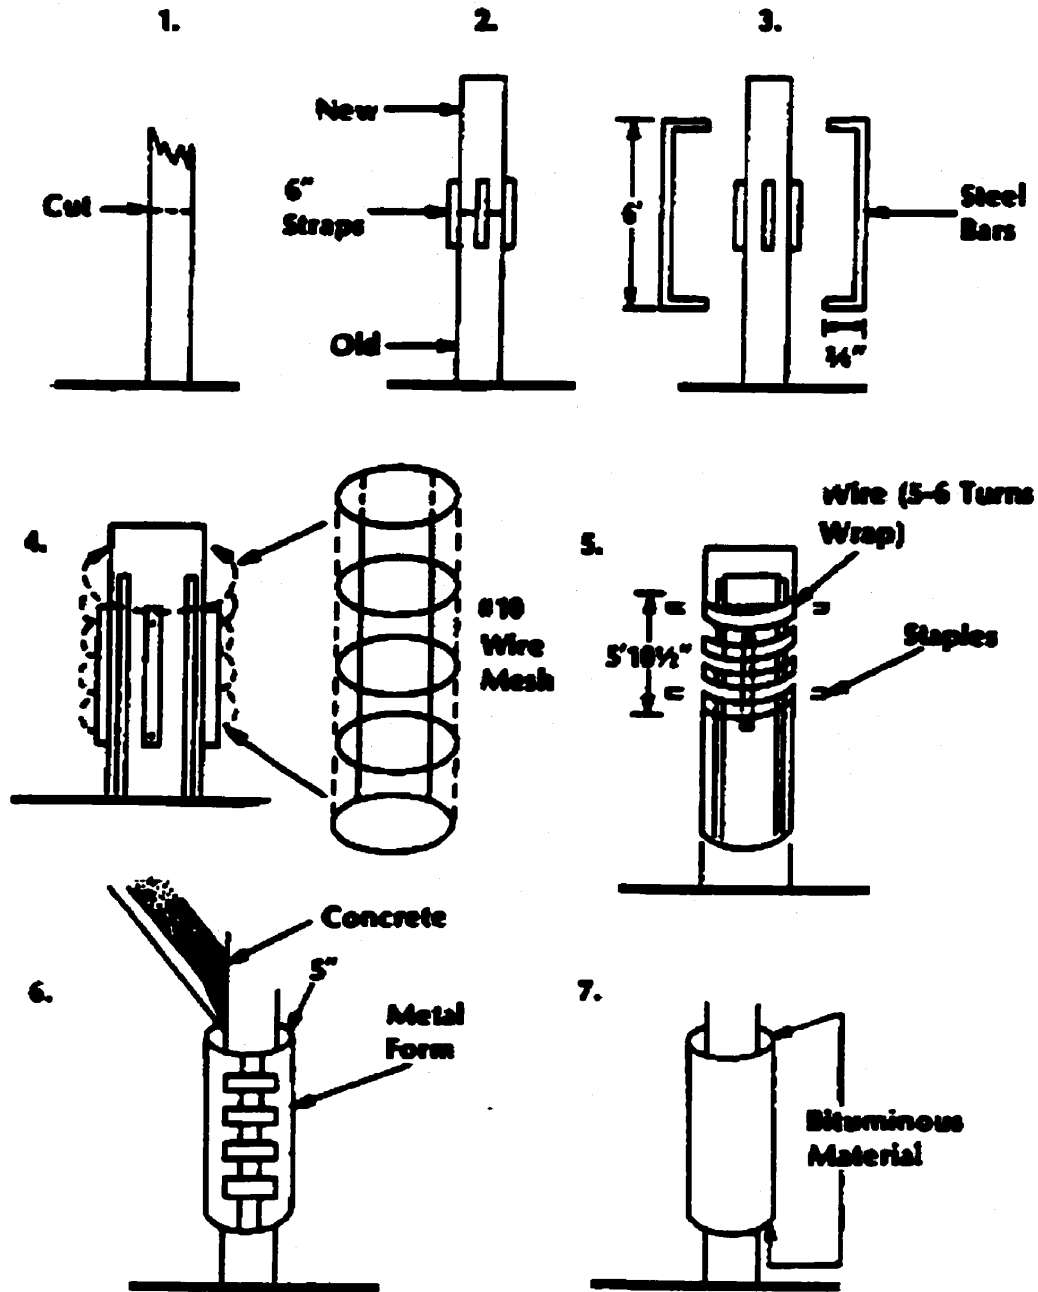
Timber Pile Repair Scheme by Splicing Using Reinforced Concrete.
